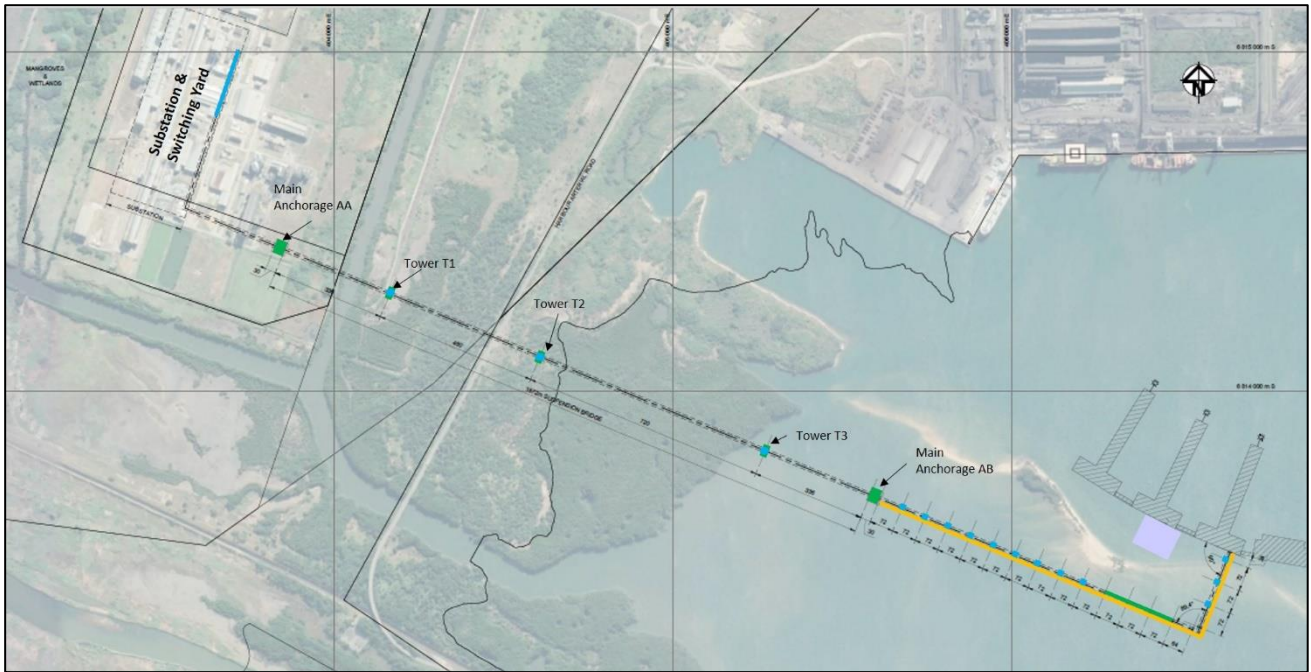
Pipe and cabling bridge structure construction sequencing – activities completed within 18 months.
